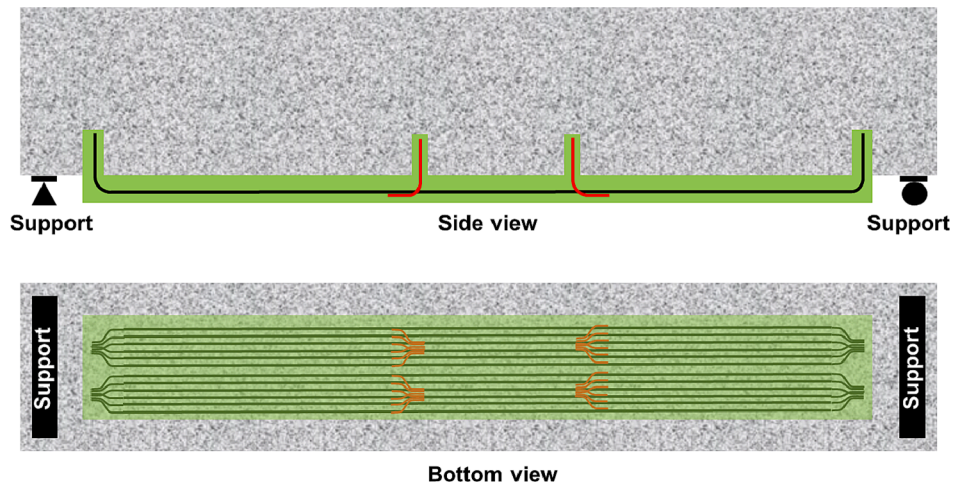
Design of the novel anchorage system for SRP flexural strengthening of an RC beam.
